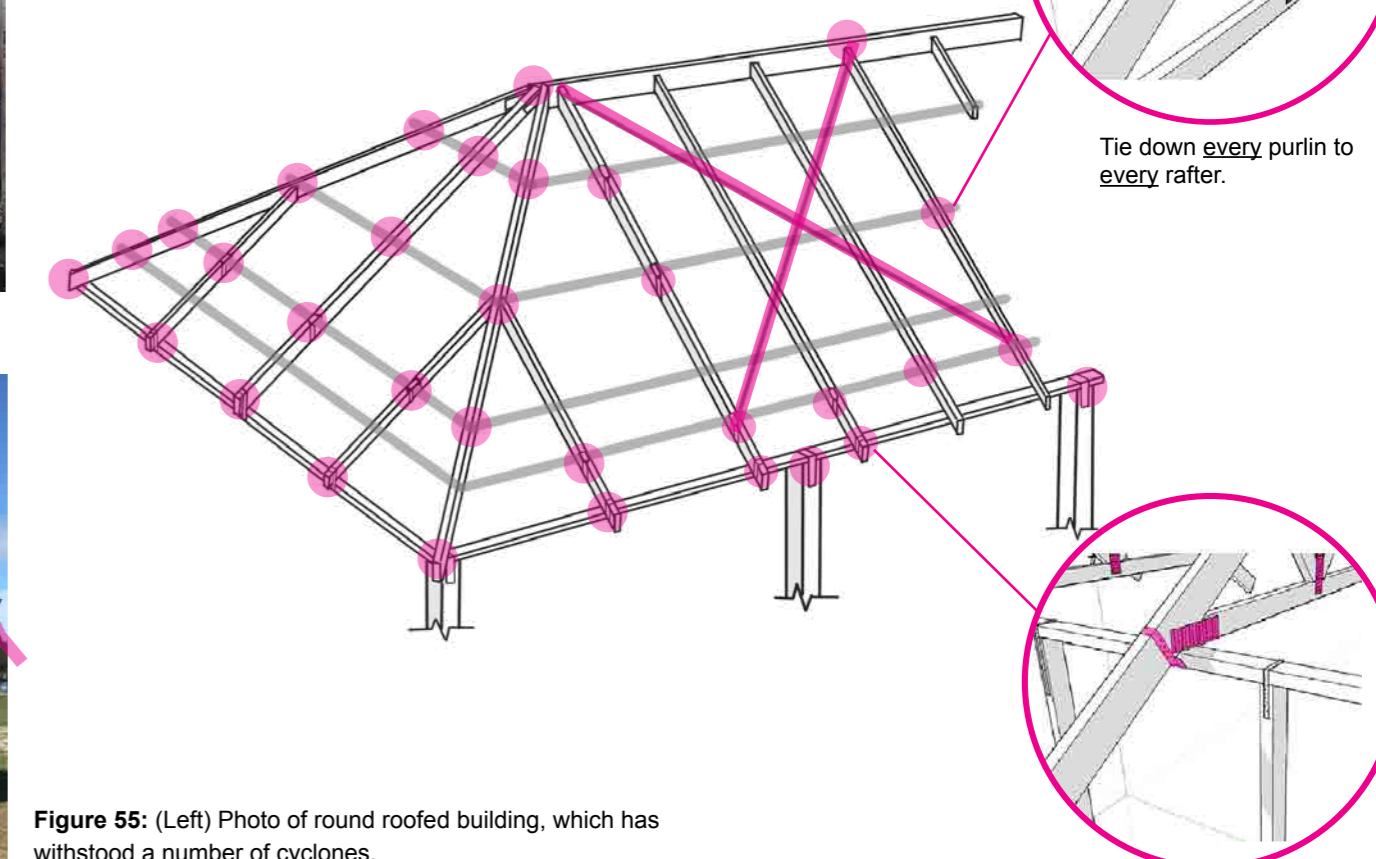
(Below) Hipped roof using timber for framing, galvanized steel strappings and cross bracing.
